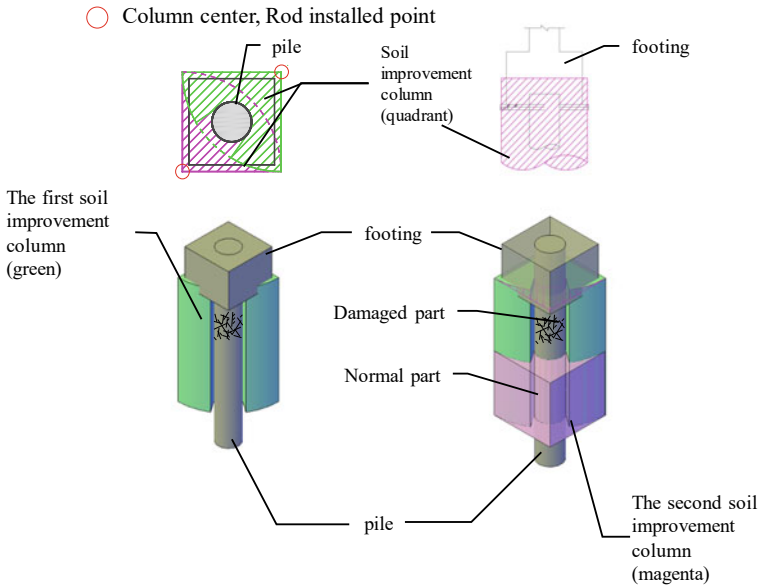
Schematic diagram of repair and reinforcement of pile foundation
